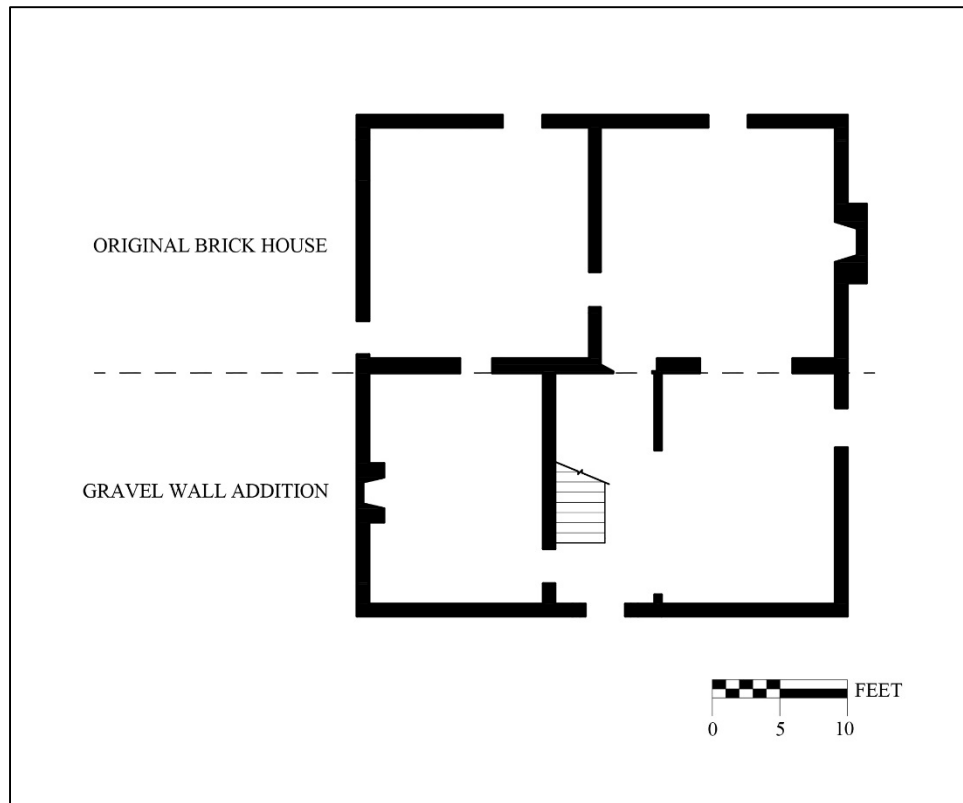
The Wilkinson House, first floor plan. Author, 2017.
